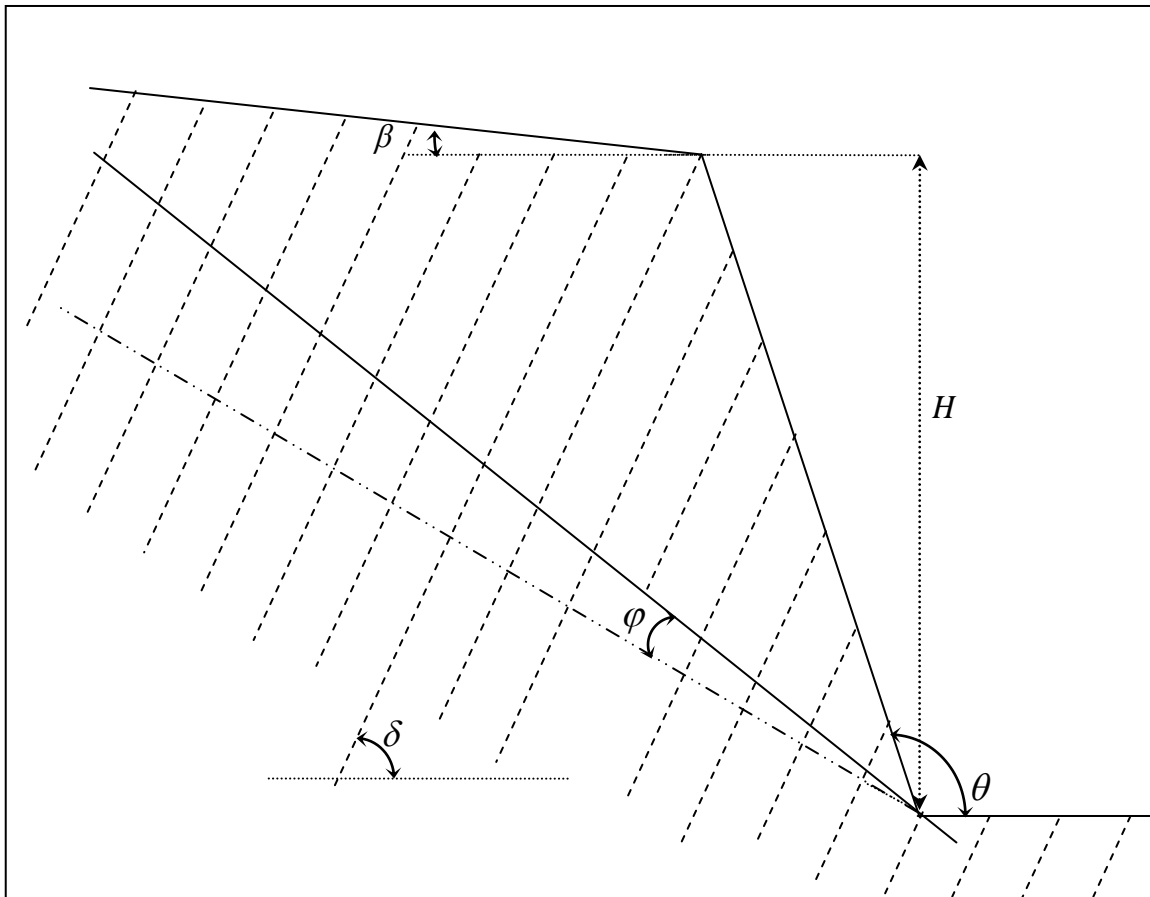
Schematic picture of a rock slope with a potential of toppling failure
